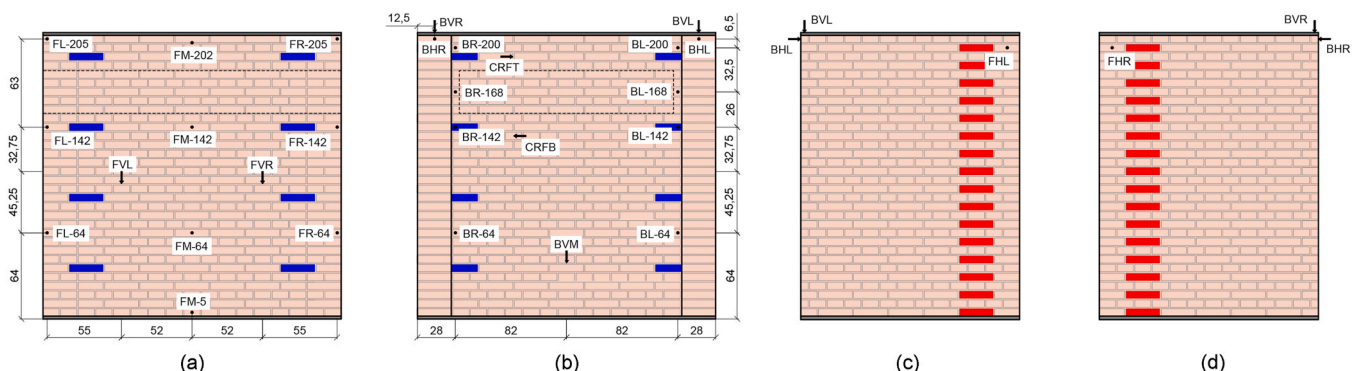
LVDTs position on the wall: (a) front view, (b) back view, (c) left view, (d) right view (measure in cm).
